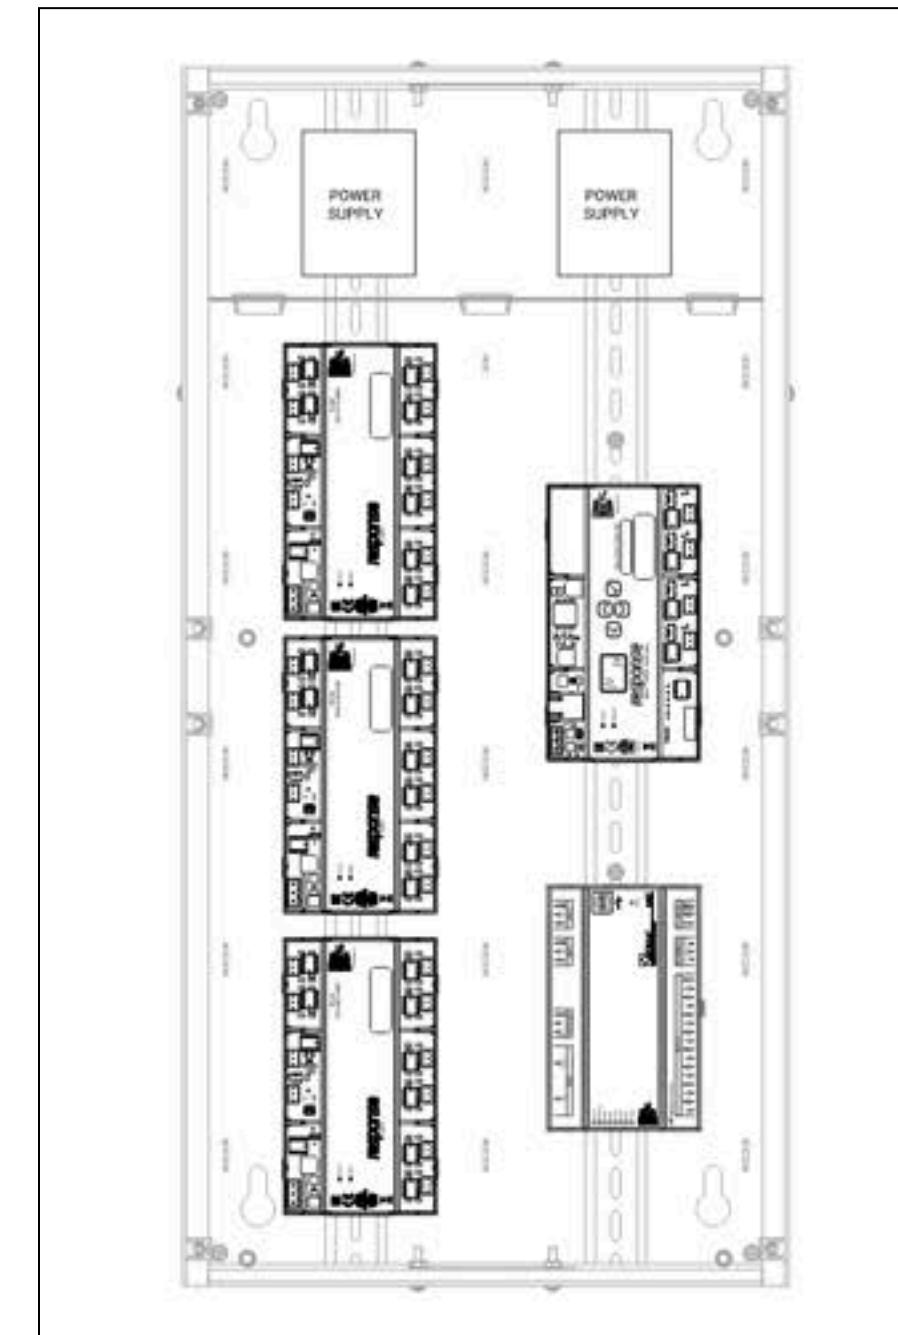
Rack elevation drawings with unit labels)
